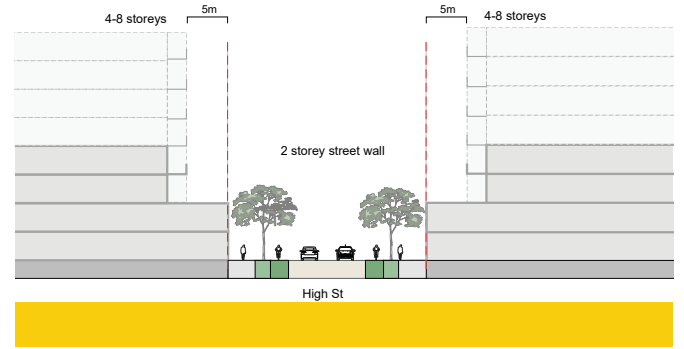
High Street, Regent Precinct. A two-storey street wall height is proposed, consistent with the existing character.
